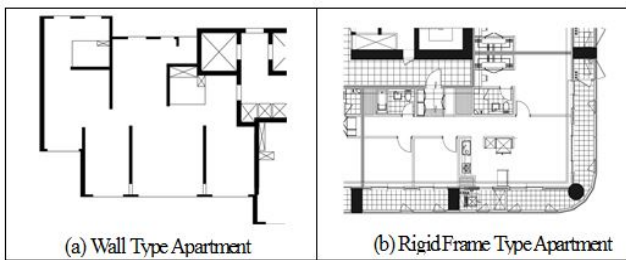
Floor Plan of Wall Type Apartment and Rigid Frame Type Apartment
